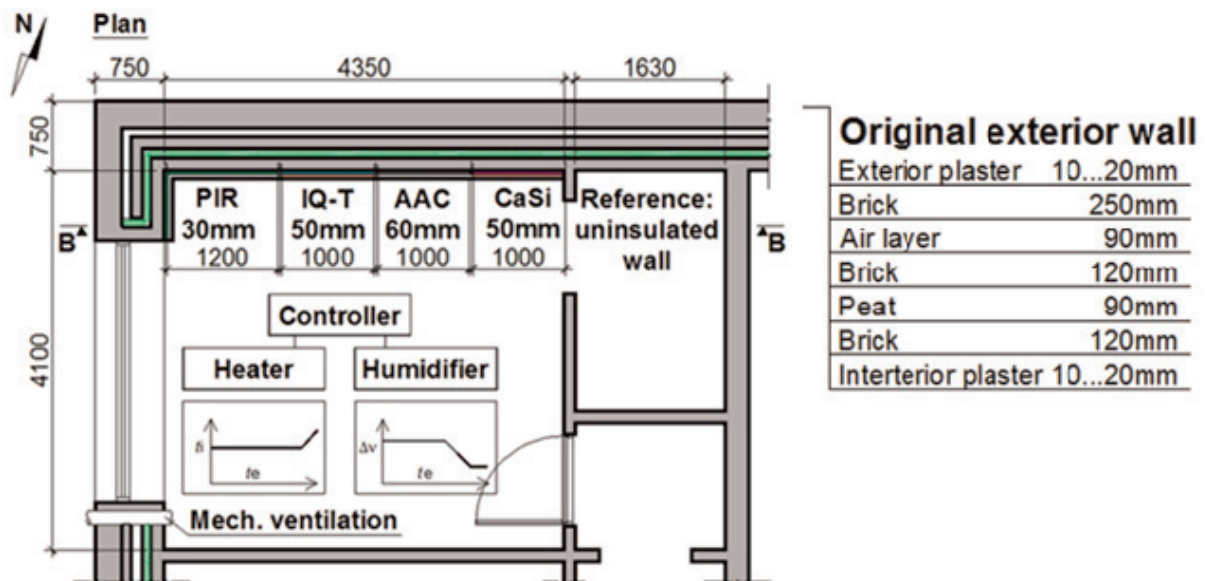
Floor plan of the room with the monitored walls. Source: [Klõšeiko et al. 2015]
